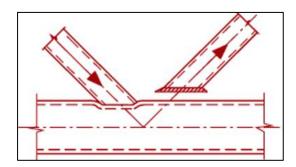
Theoretical failure mode of punching of wall chord for diamond bird-beak joint under compression loading
